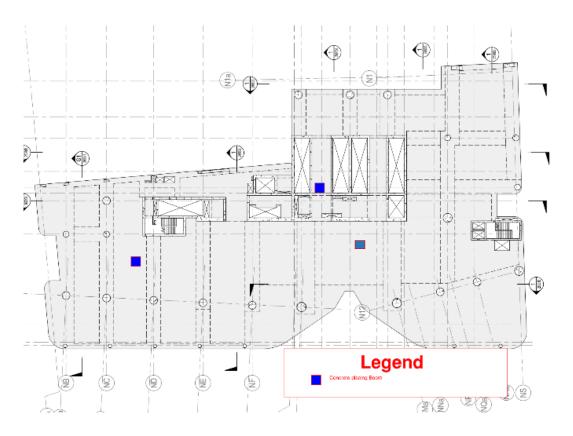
Typical Structural Floorplate Low Rise Level 6-10 with Concrete Placing Boom
